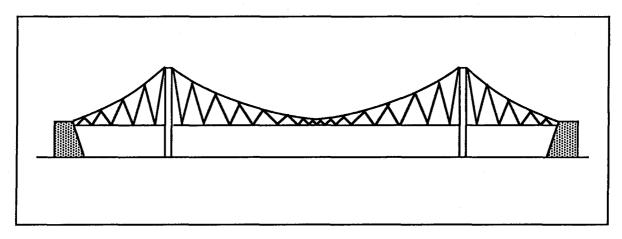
SUSPENSION SYSTEM WITH INCLINED HANGERS BETWEEN THE MAIN CABLE AND THE STIFFENING TRUSS
